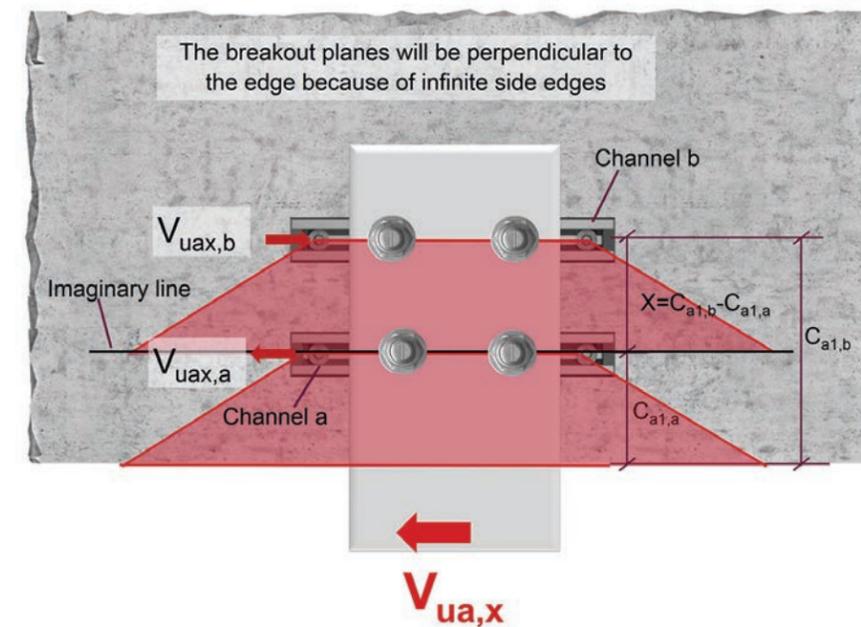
Longitudinal Shear – Plan view.
